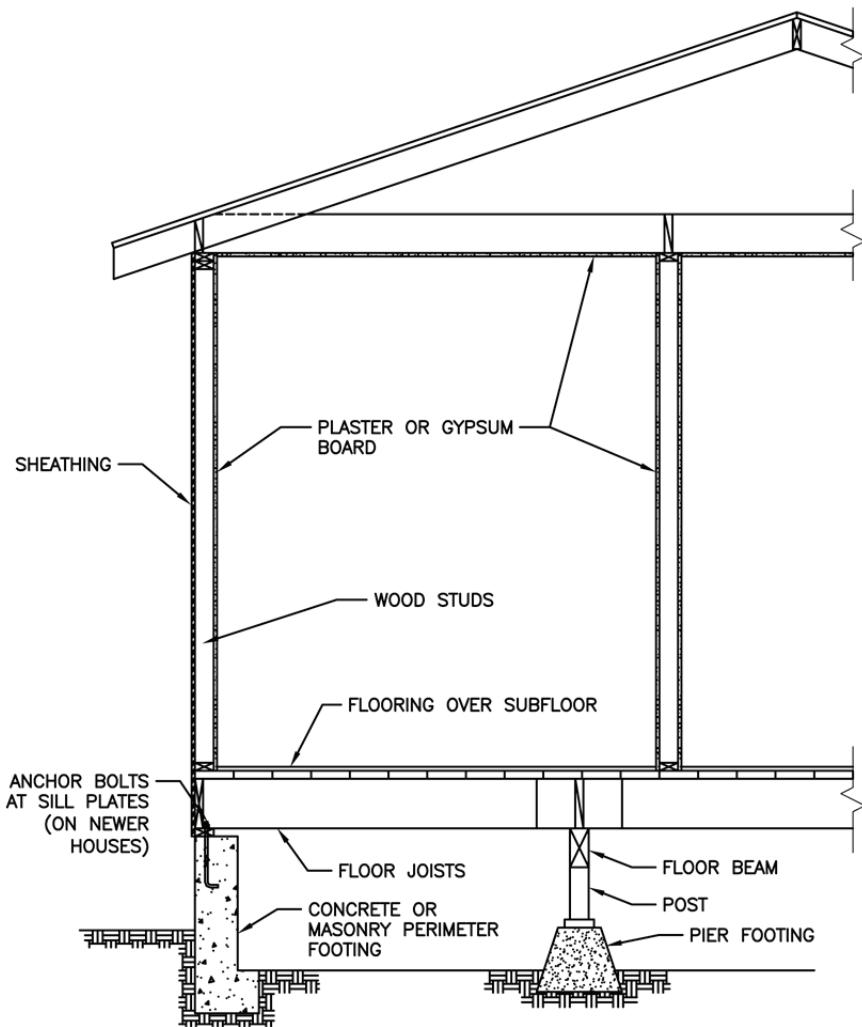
Section through a variation of the basement dwelling where the perimeter foundation walls enclose a crawl space (from ATC, 2002b).
